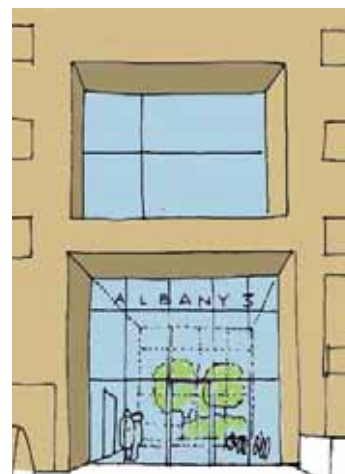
Entrances to important buildings, apartments and non-residential uses should be more civic in their appearance
